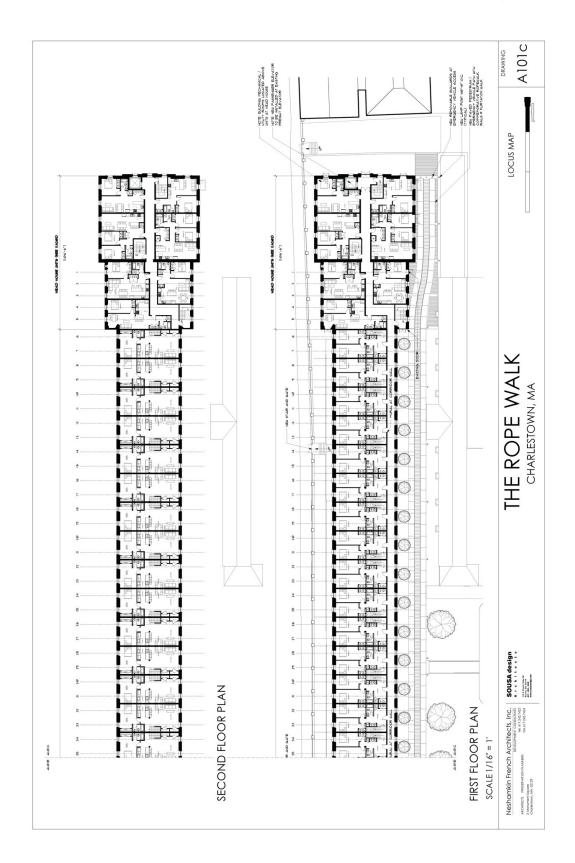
NPC 1st Floor Plan - Ropewalk
